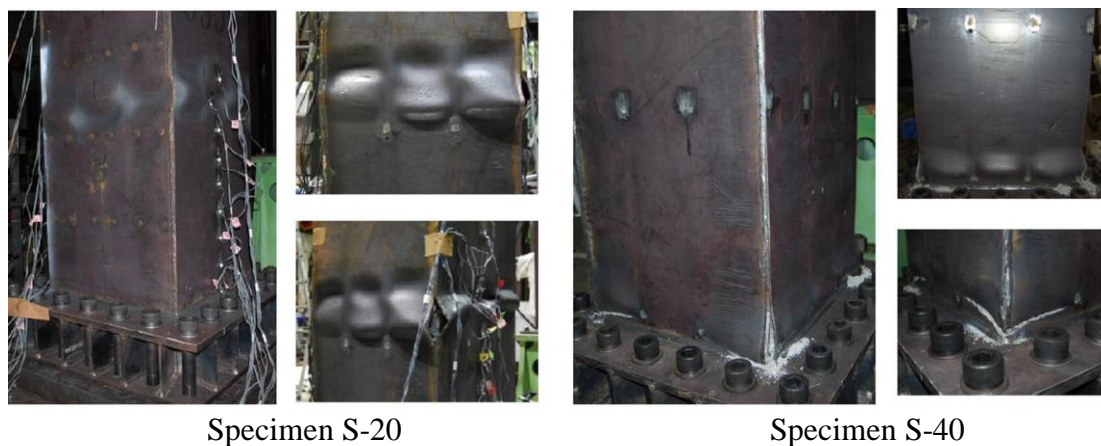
Failure mode of partially concrete infilled rectangular CFT specimens (Yuan et al. (2013))
